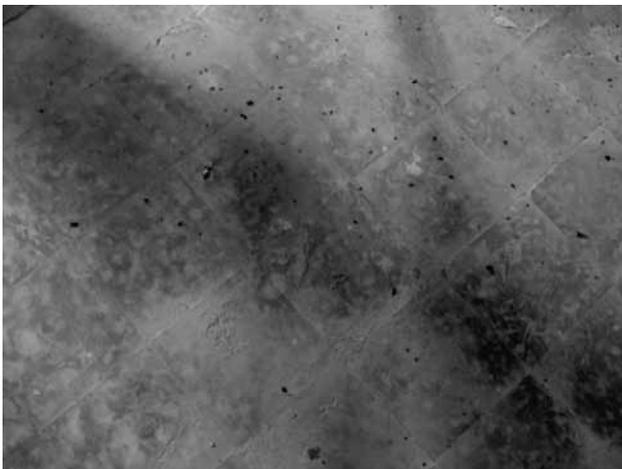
Interior of third floor hydraulic tile detail and interior of third floor terrazzo flooring and ceramic tile author's photo, January 2007
